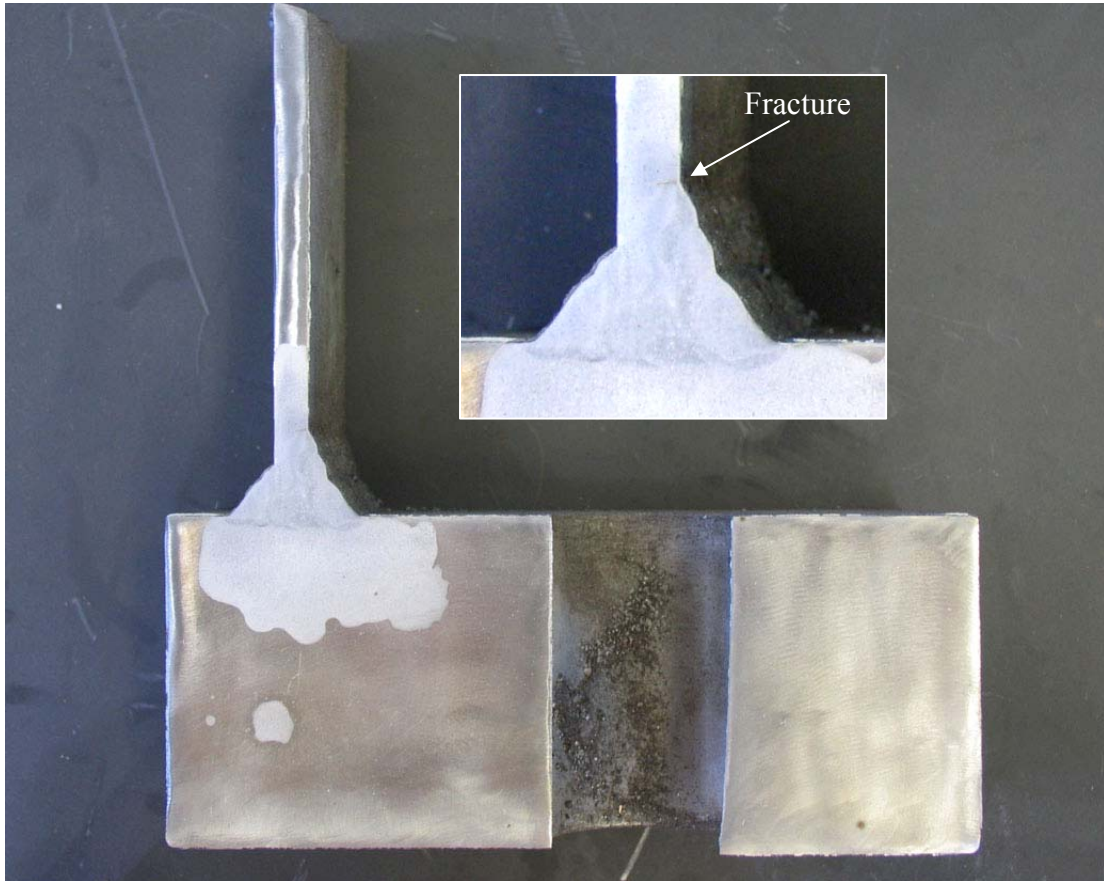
Etched cross section of Texas full penetration weld connection
